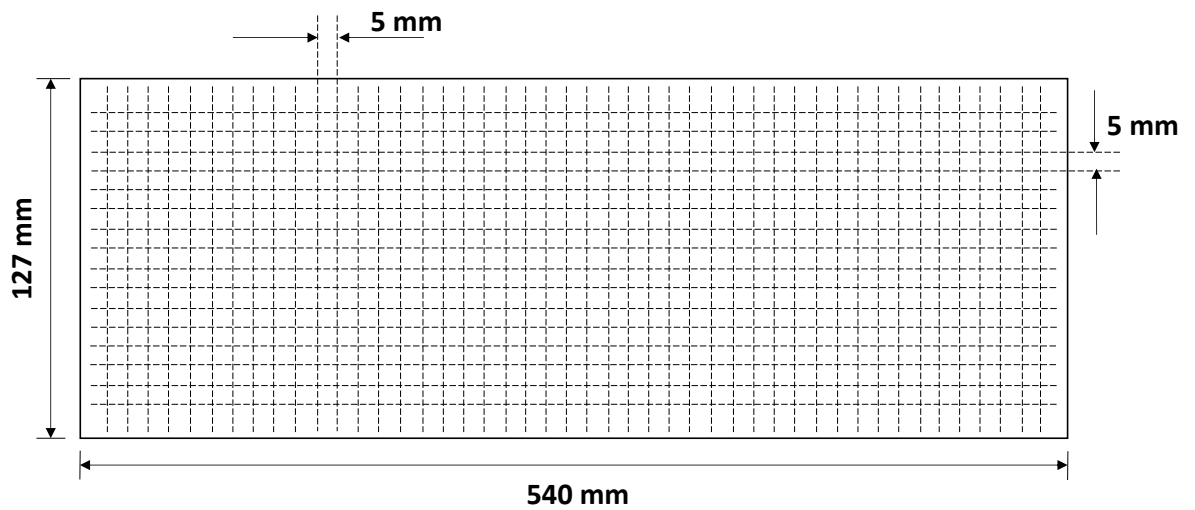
Dimensions (in plan view) of reinforced concrete slab and steel mesh
